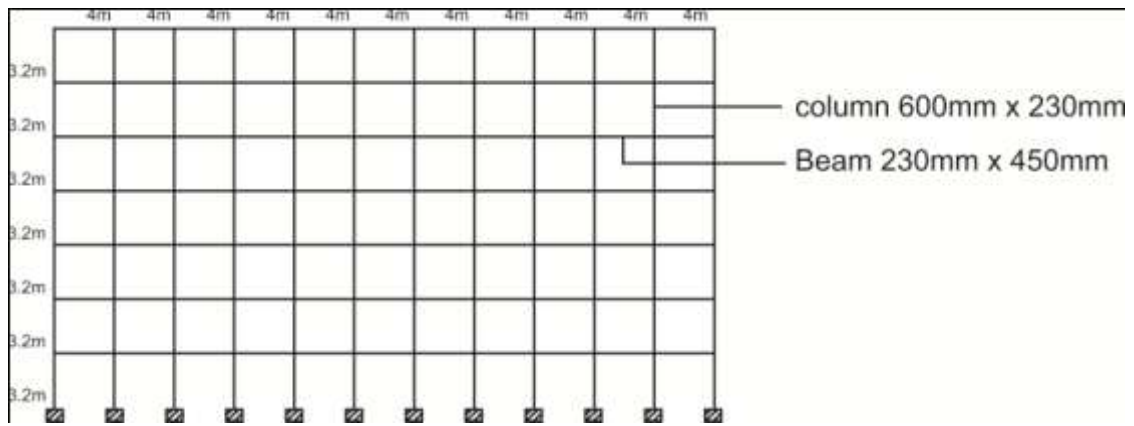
Schematic Representation of 7 Storey 10 Bays RCC Frame Without Infill wall.
